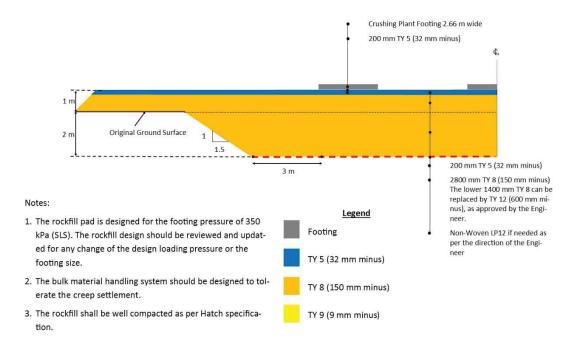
Foundation Configuration Sketch for Crushing Plant
